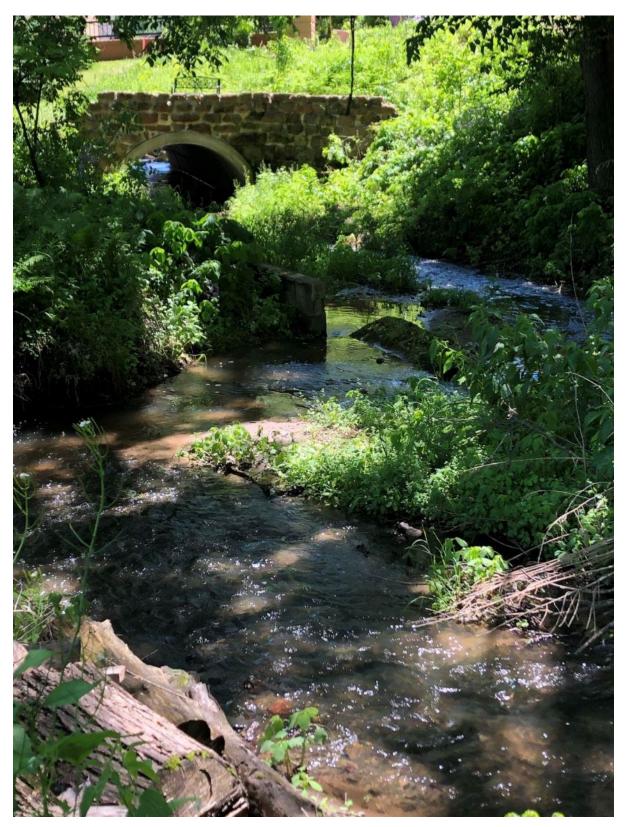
Spring Creek looking downstream at a failed retaining wall in the channel.
